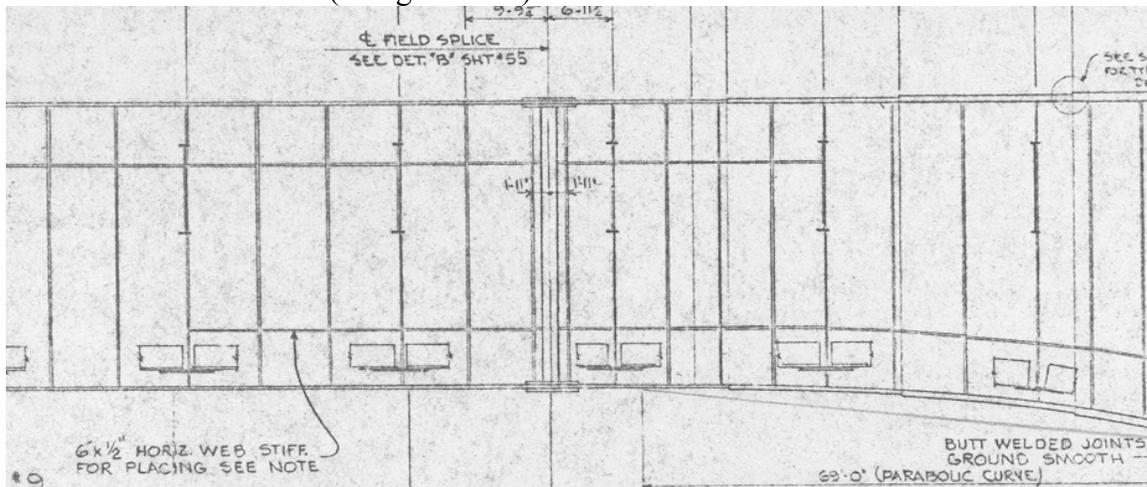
Welded horizontal stiffener (Bridge #9800)
